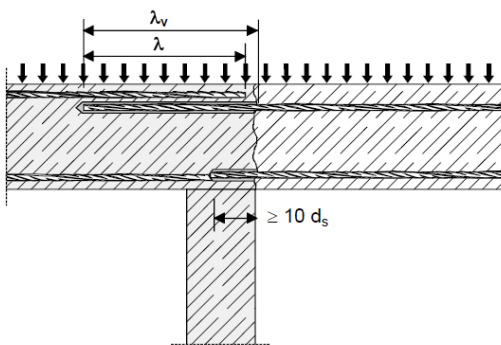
Overlap joint for rebar connections of slabs and beams
